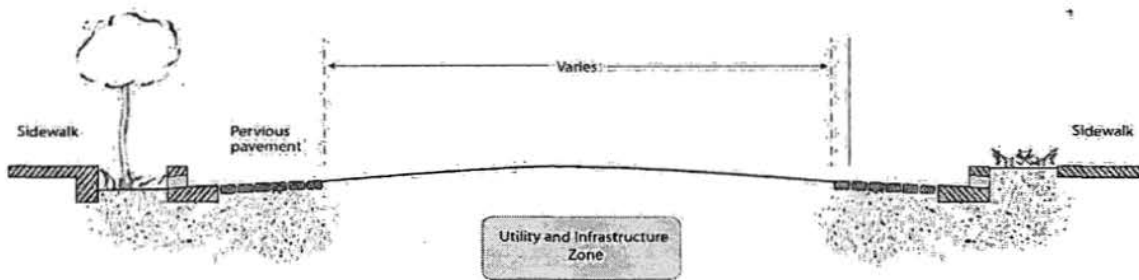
Possible pervious pavement design layout (*Model for Living Streets Design Manual, 2011*).
